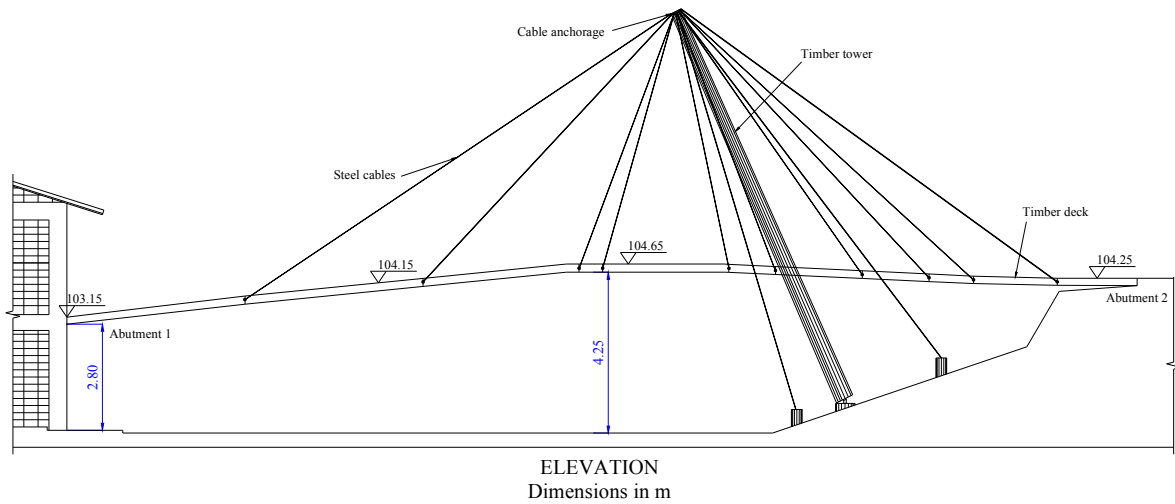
Elevation lateral of the cable-stayed timber footbridge, Pletz (2003)
